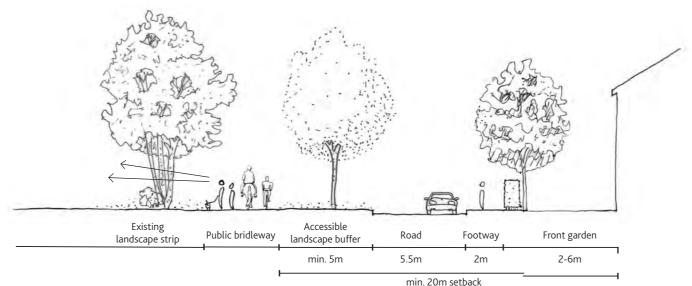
Typical street section 11 - typical street section in Rural Fringe area
